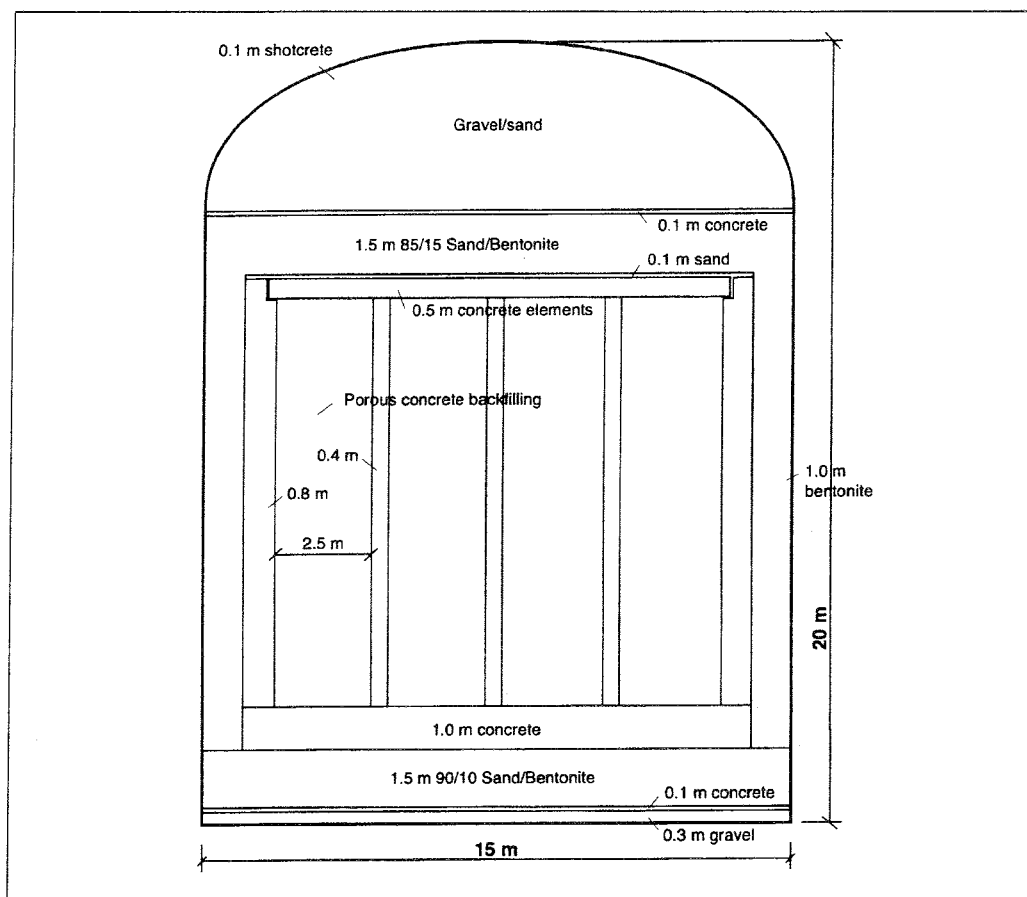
Cross-section of rock cavern for operational waste from CLAB, the Encapsulation Plant and Studsvik.
